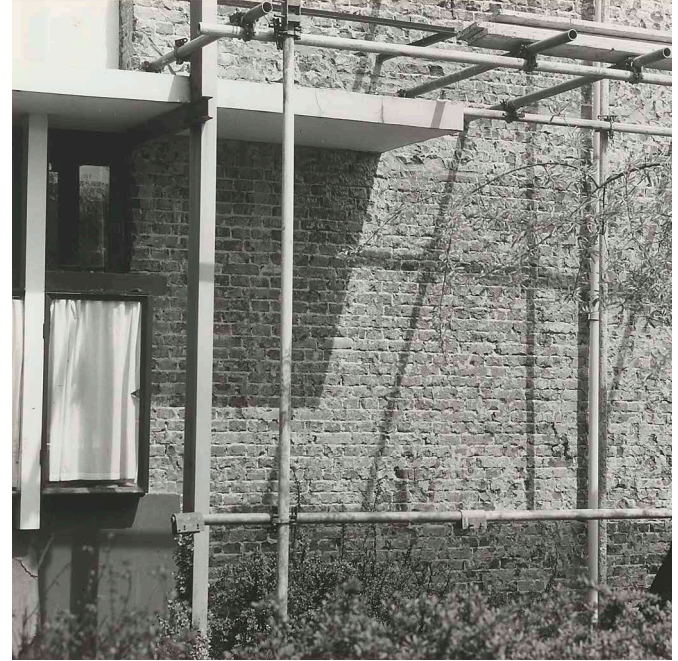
Traces of plaster still visible on the wall below the studio window on Prins Hendriklaan
